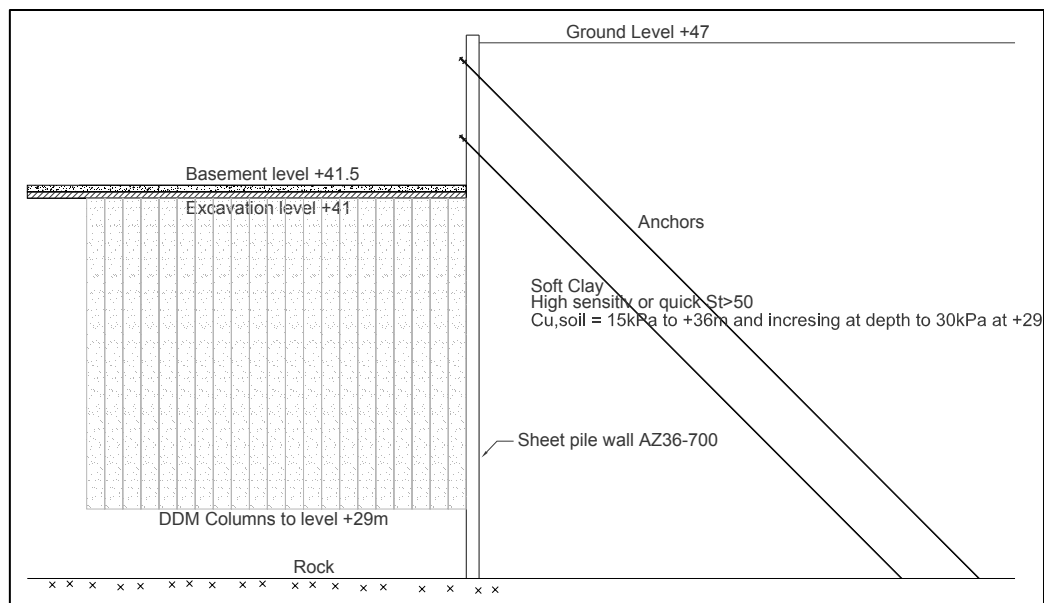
Cross section passive support to sheet pile wall at Sörkedalsvien in Oslo, Norway.
